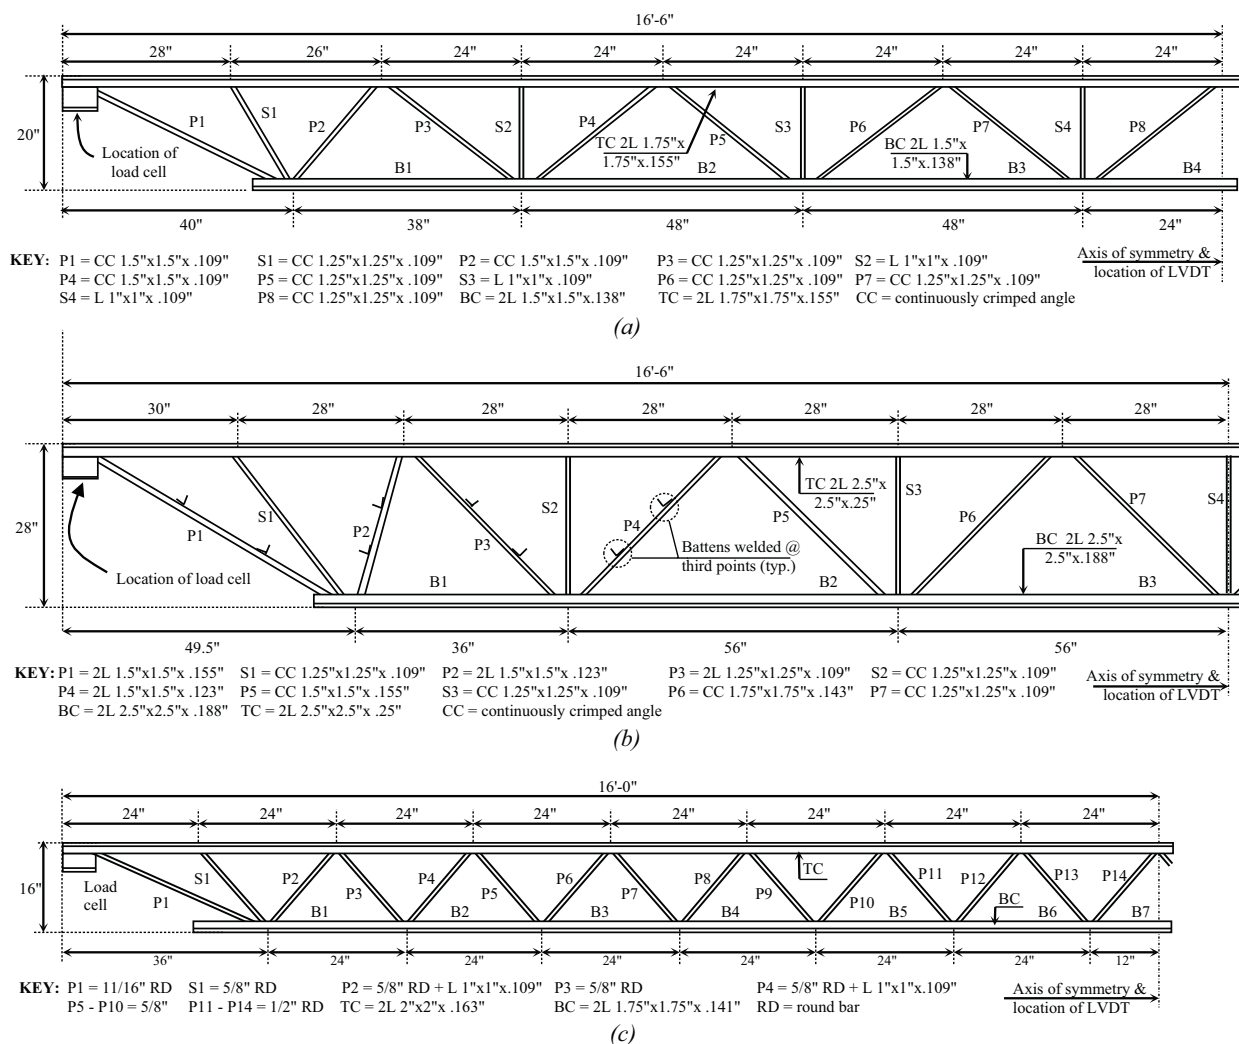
Sample details: (a) typical K-series details (samples J1-1 through J1-6); (b) typical LH-series details (samples J2-1 through J2-6); (c) typical rod-web K-series details (samples J3-1 through J3-6).
